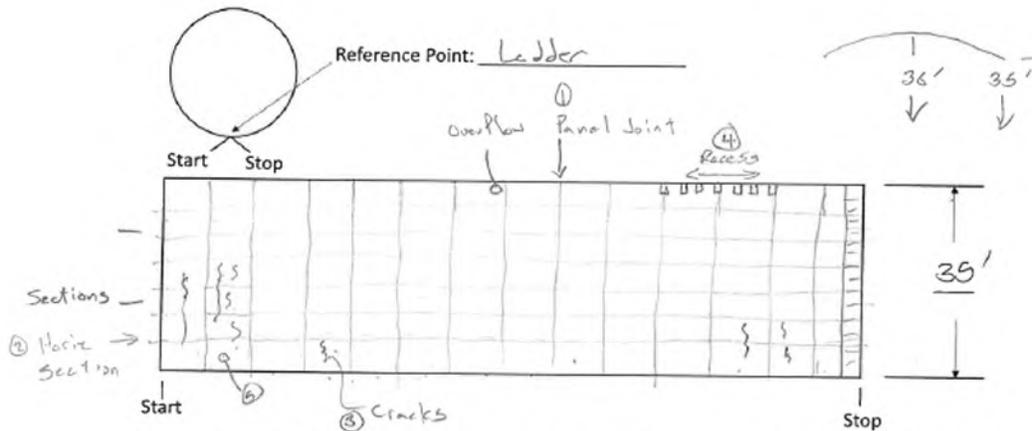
Reservoir INTERIOR WALL Elevation– Note location of ladders and other features.
